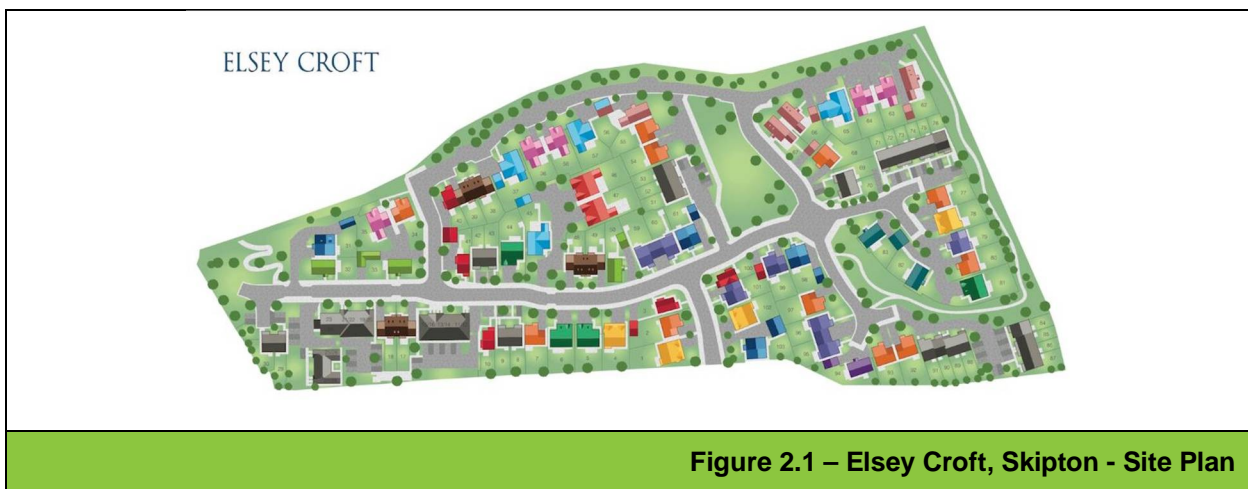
Elsley Croft, Skipton - Site Plan
